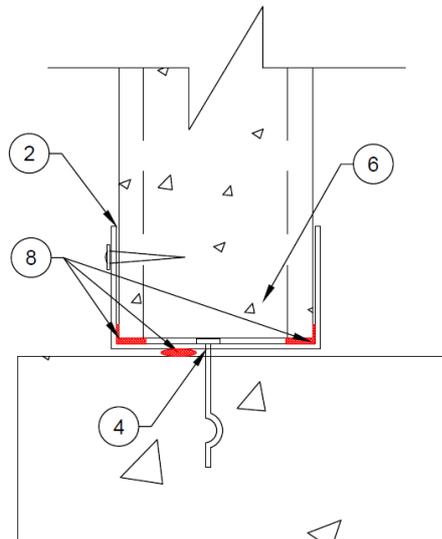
Bottom Detail for Vertical Speedpanel Wall
